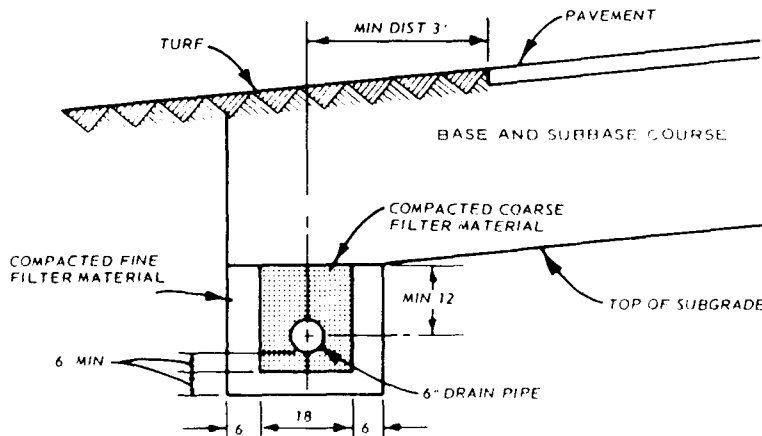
Typical details of base and subbase drains (from U.S. Army 1979).
